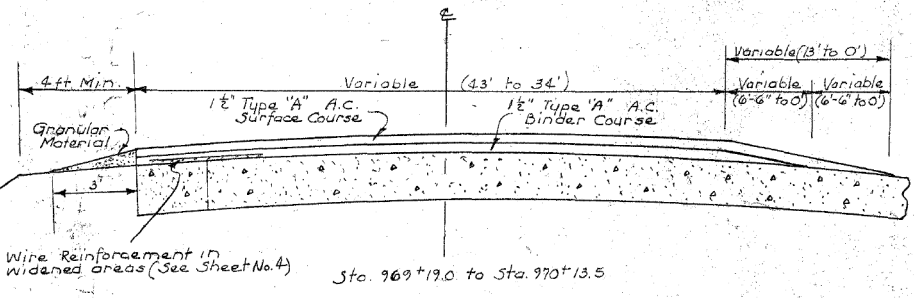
DETAILS OF BRIDGE AND BRIDGE APPROACH RESURFACING
